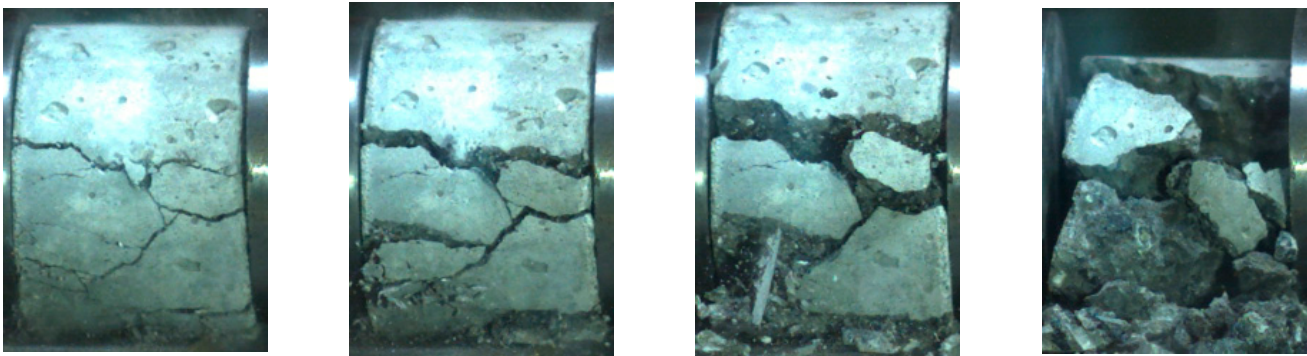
Failure model of specimen: (a) center crack of specimen; and (b) crack expansion mode of specimen.
